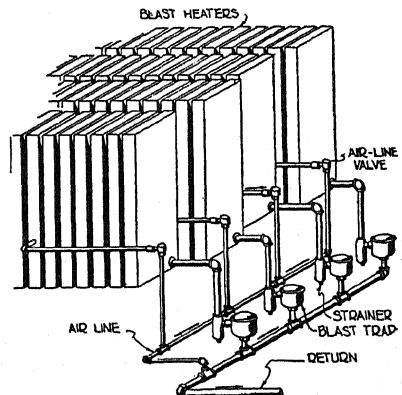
TYPICAL CONNECTIONS TO CENTRAL FAN SYSTEM HEATING UNITS EXCEEDING 12 SECTIONS
